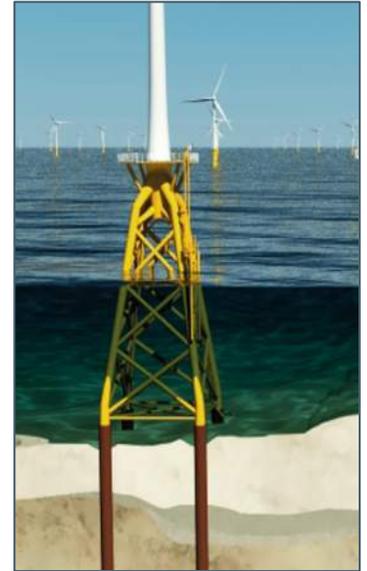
(Left): Wikinger OWF jacket foundations, Nov. 2016 (Courtesy of Bladt)
